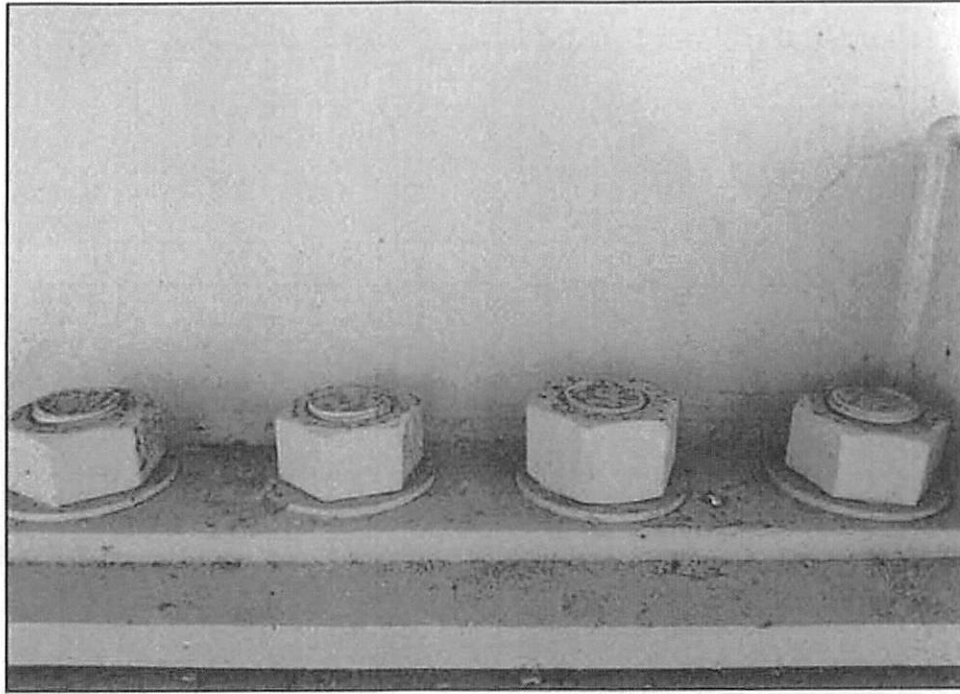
Typical view of the anchor bolt nuts engagement at west face of the slide bearing.
